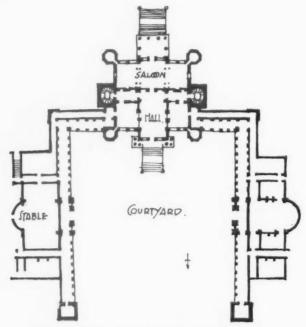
SEATON DELAVAL HALL, NORTHUMBERLAND. GROUND PLAN.
